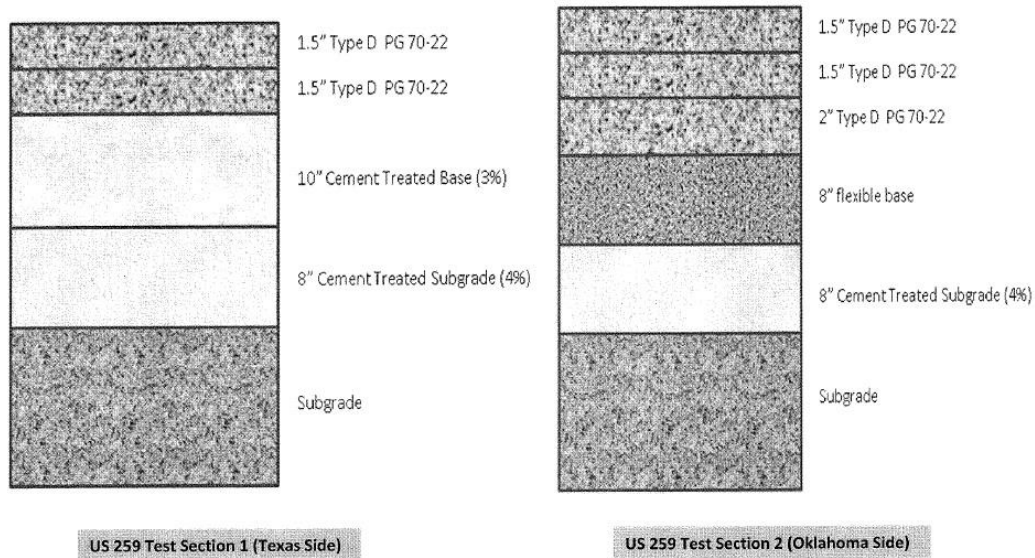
Structures of Identified Pavement Sections 1 and 2 in US 259
